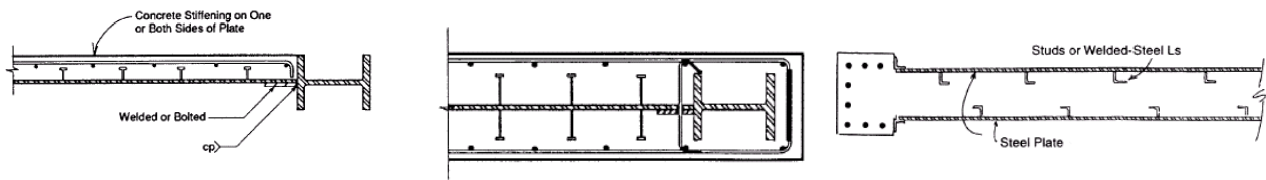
Composite steel wall: RC on single side (*left*), typical RC encasement (*middle*) and infilled with two plates (*right*) (after AISC, 1997).
